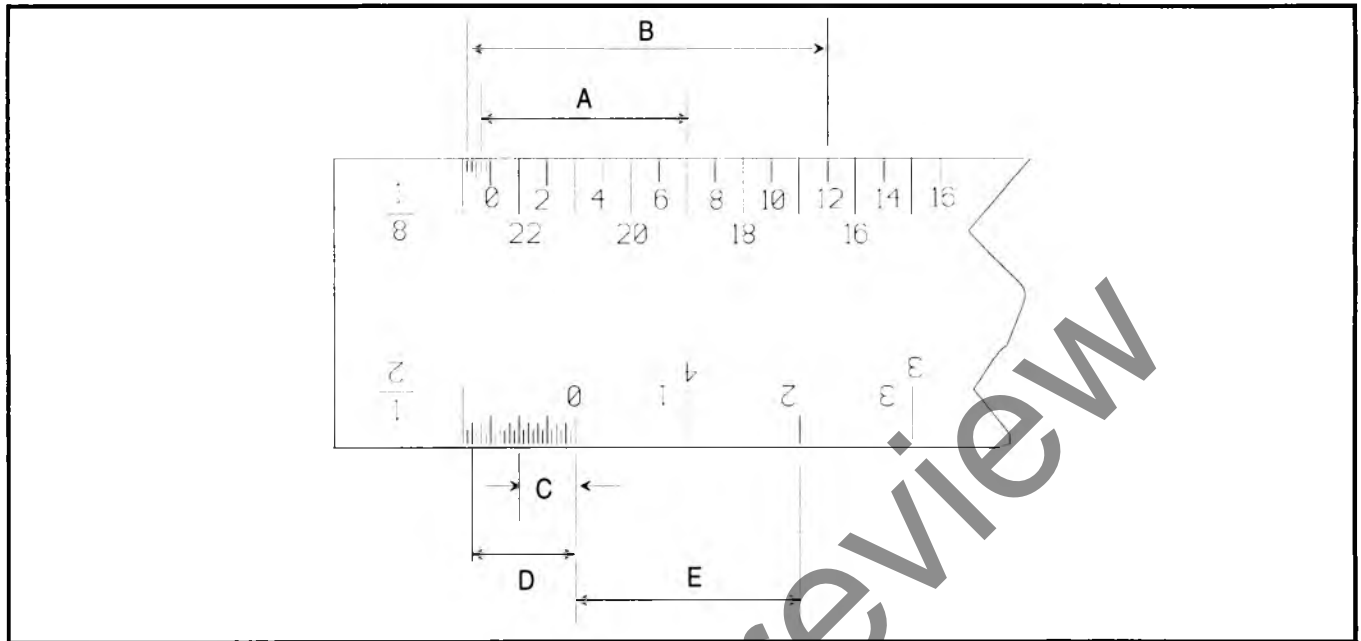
The $\frac{1}{8}$ -inch architect's scale used to measure building dimensions.
